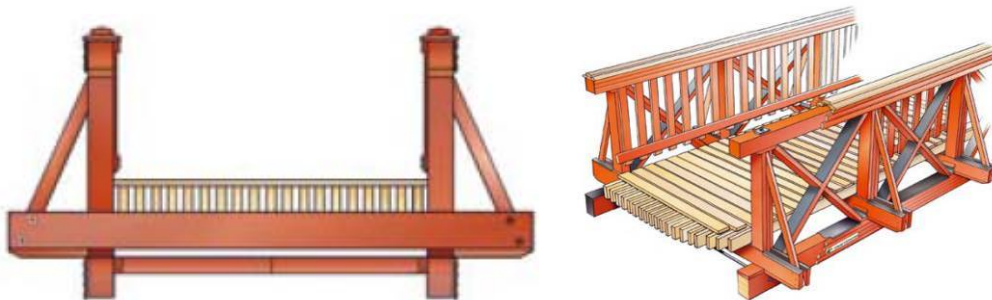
Timber truss bridge. Figure from Träbroguiden, Martinsons (2010).
